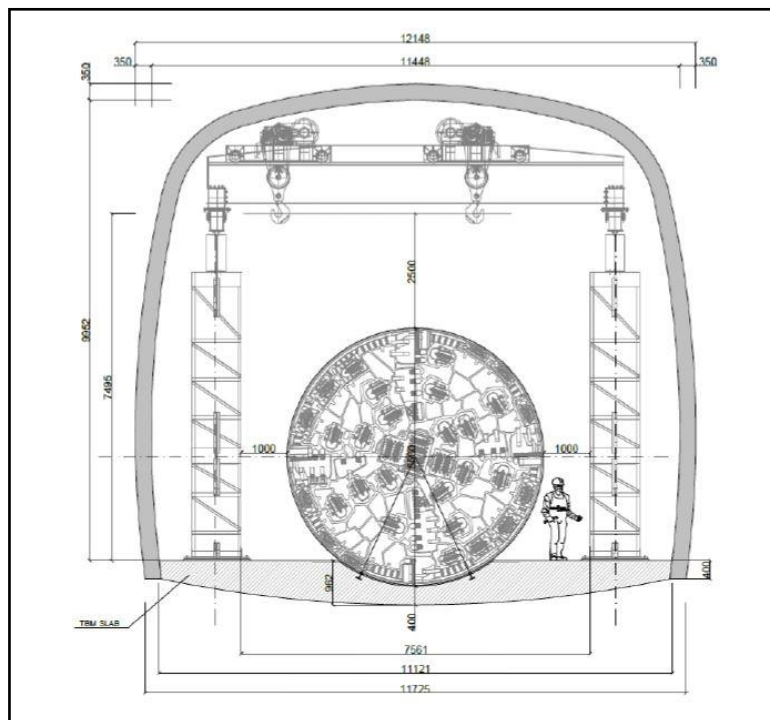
Gerede Water Tunnel TBM Assembly Chamber Plan (Grothen, 2018)
